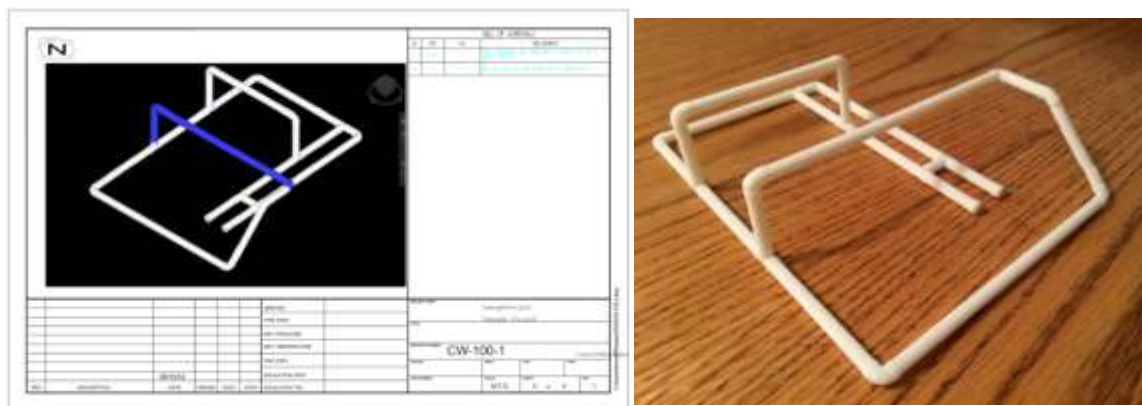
Three-Dimensional Physical Model – Spool 1
